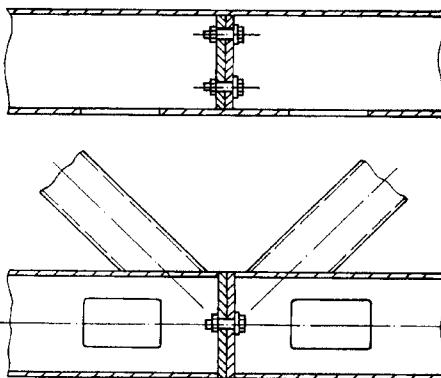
Hidden, bolted butt joint with head plates in the compression chord of a lattice girder
